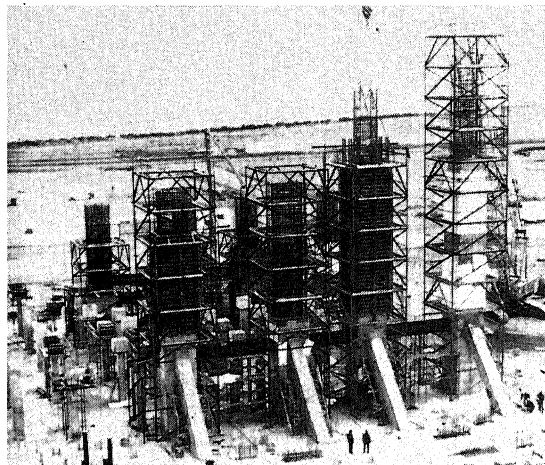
Construction Sequence for Reformer Roof Support Concrete Columns
